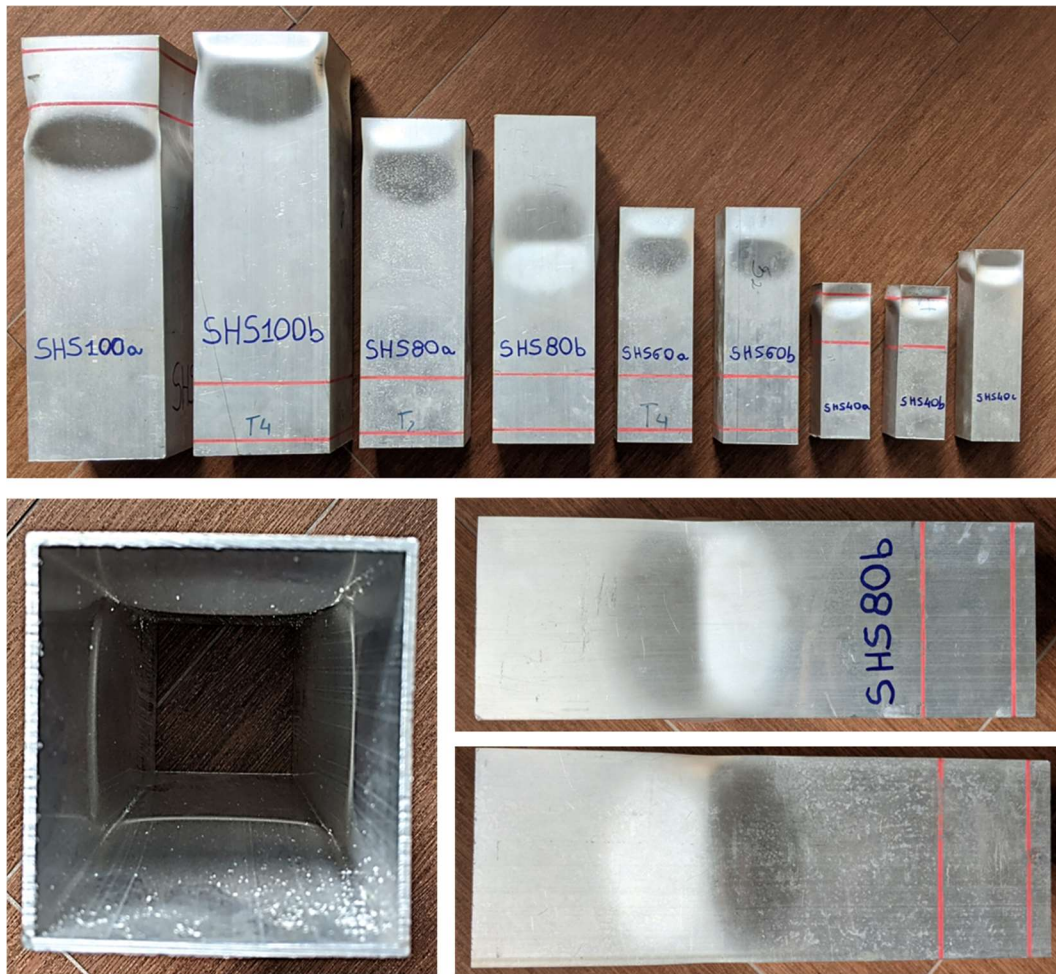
Specimens after stub column tests showing typical buckling shape for box section.
